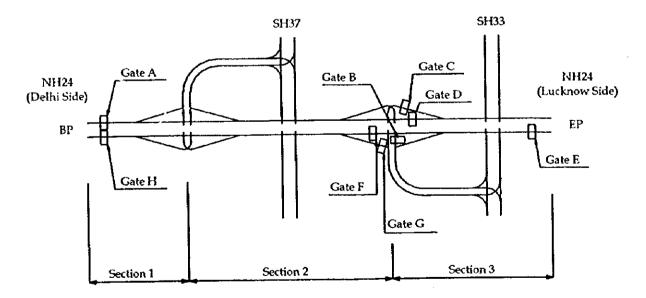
Proposed Arrangement of Toll Barrier/Tollgate for Bareilly Bypass
